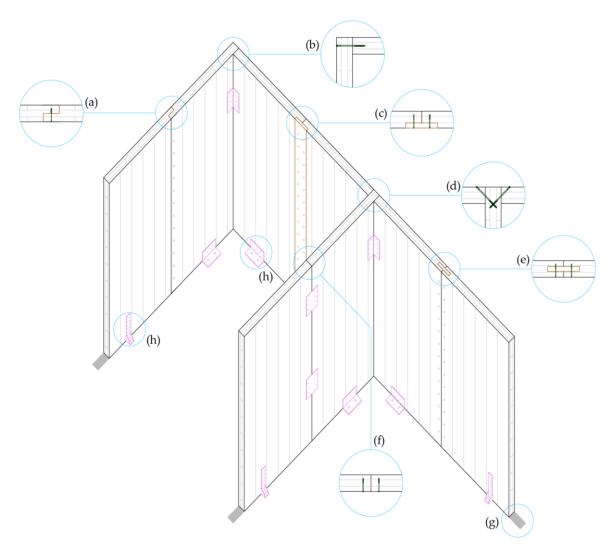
Examples of connections for CLT shear walls: (a) Coupled wall with lap joint; (b) corner/"L-shaped" joint; (c) coupled wall with external spline joint; (d) intersection/"T-shaped" joint; (e) coupled wall with internal spline joint; (f) single wall joined with steel plates; (g) optional decoupling strip; (h) connectors and fasteners (hold-down and steel brackets with self-tapping screws, spiral, or ring nails) [100].
